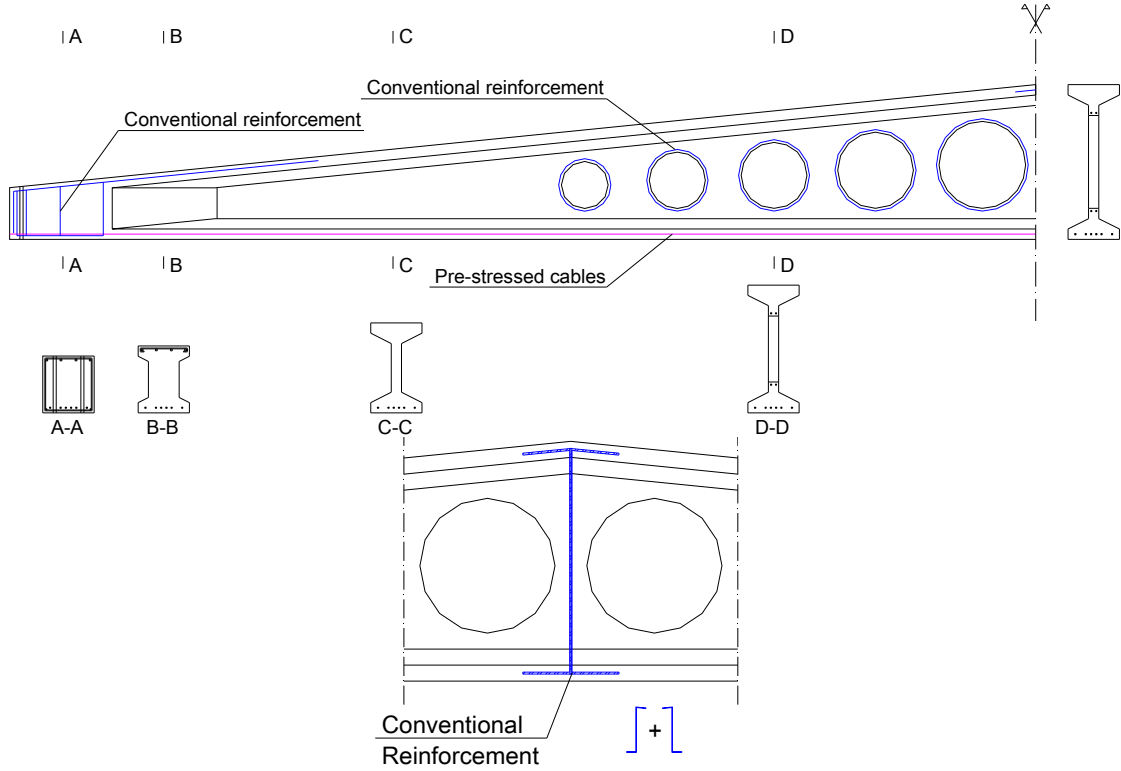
Recommended reinforcement for the SFRSCC Delta beams
